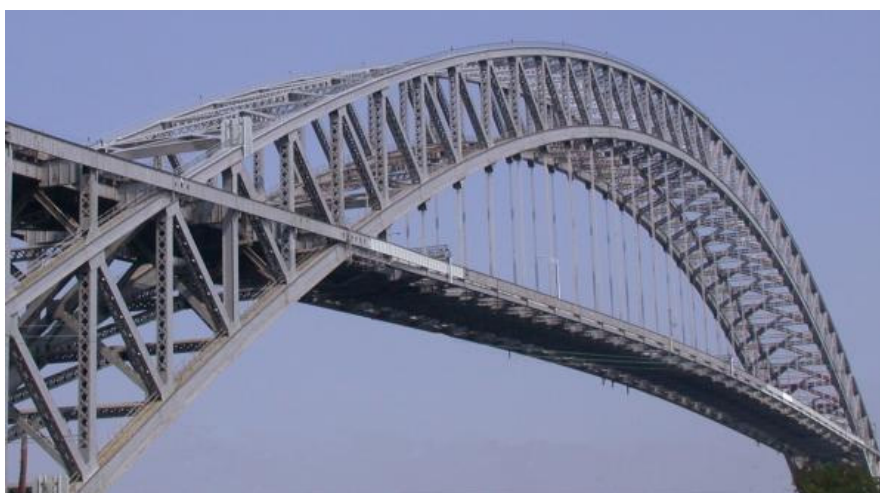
Bayonne Bridge – New Jersey [14]
